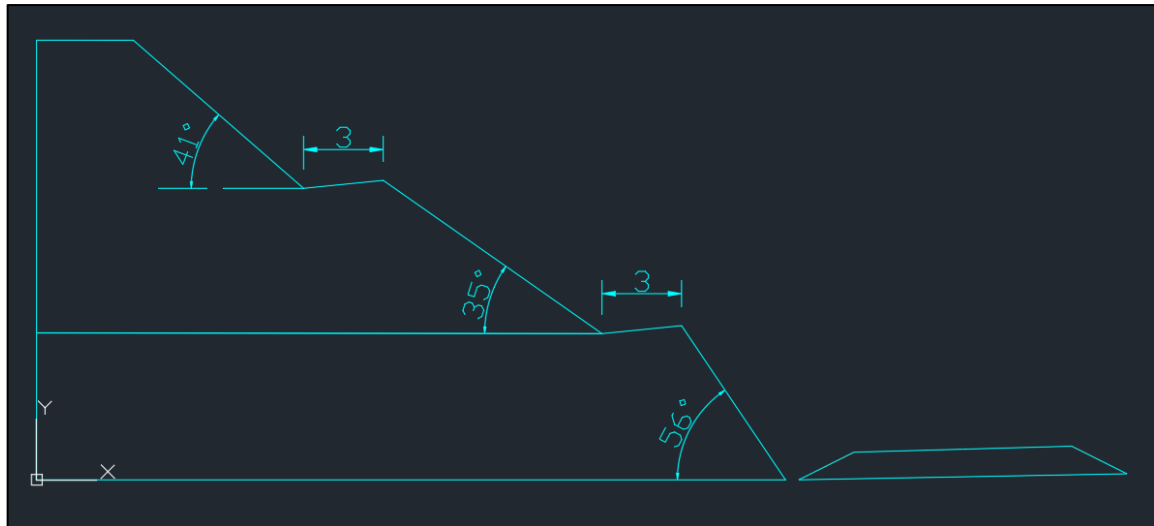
Geometry of cut slope with two benches and FS of 1.5.
